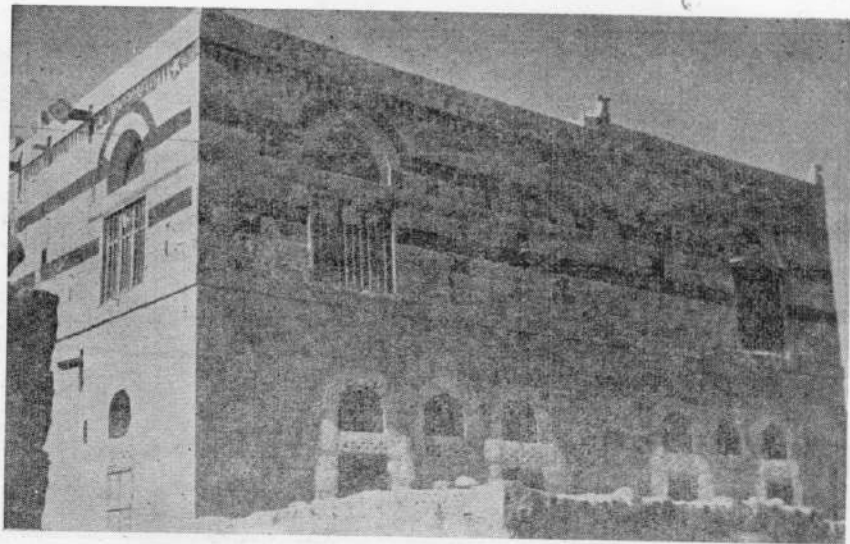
Dressed stone two storied house in village Dhi-Hawlan, use of wood piece at corner of walls and over window. Apparently no damage.
